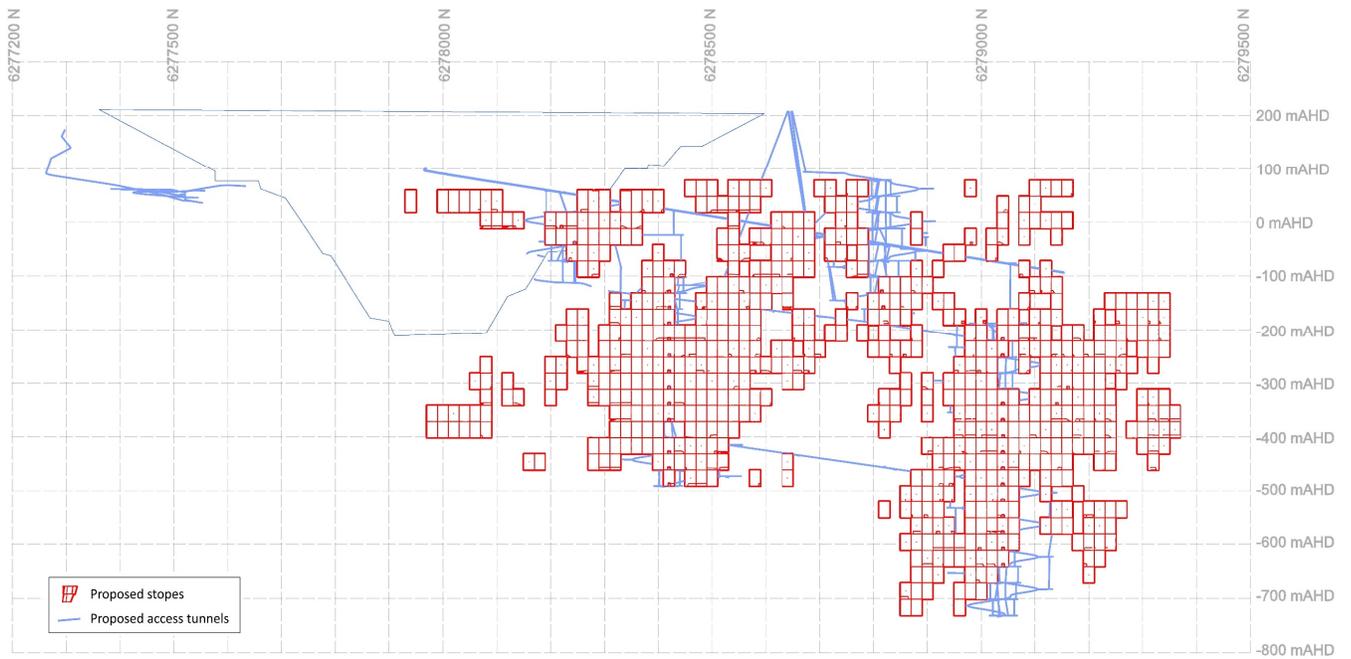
Stopes and access tunnels - elevation view looking west (Northings in m MGA Zone 55)
